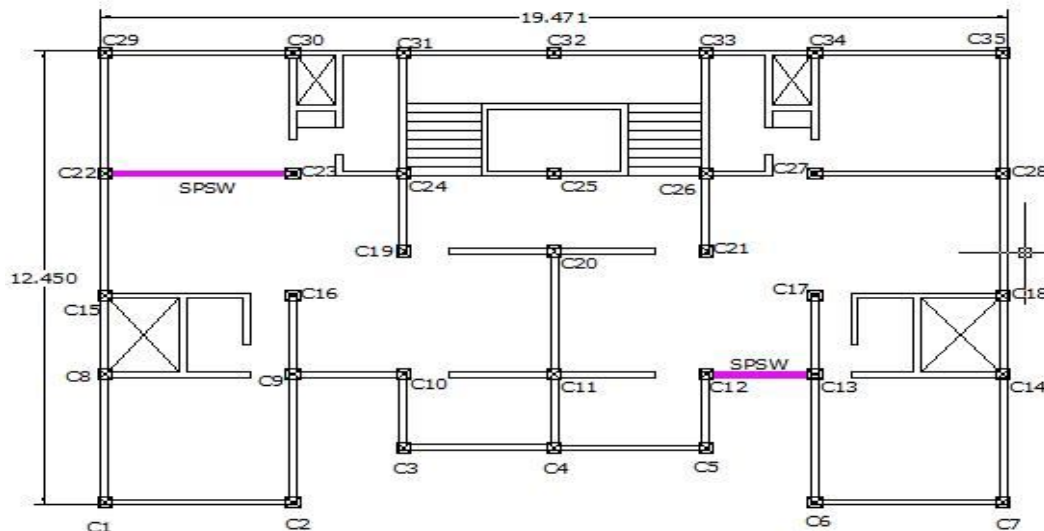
Plan showing Steel frame building with SPSW3 (Model 3)
